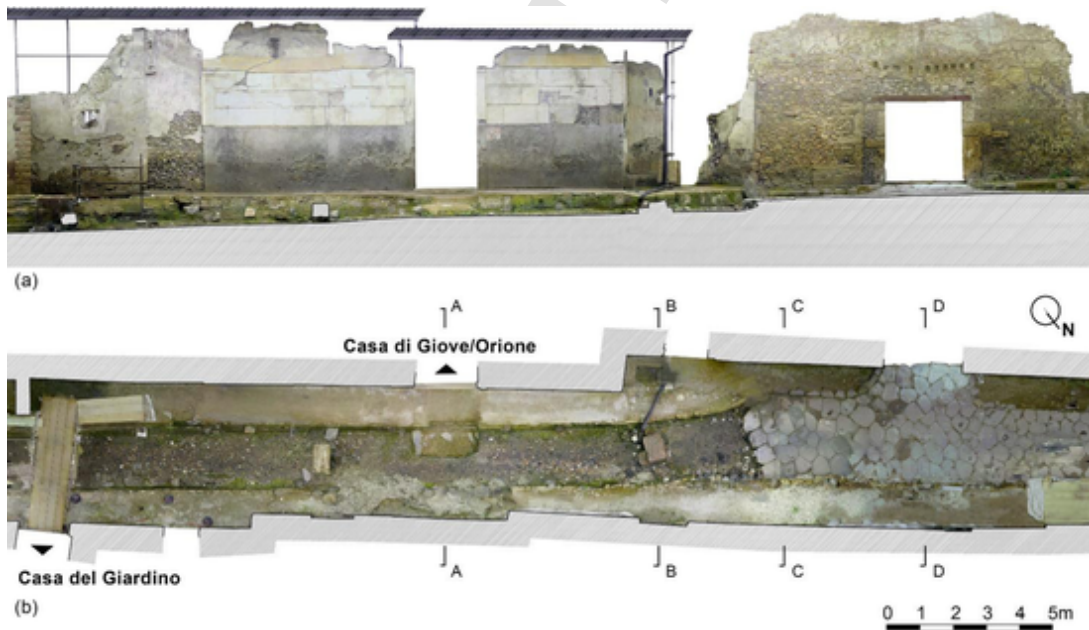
Central section of vicolo dei Balconi: west front (a) and plan (b).
